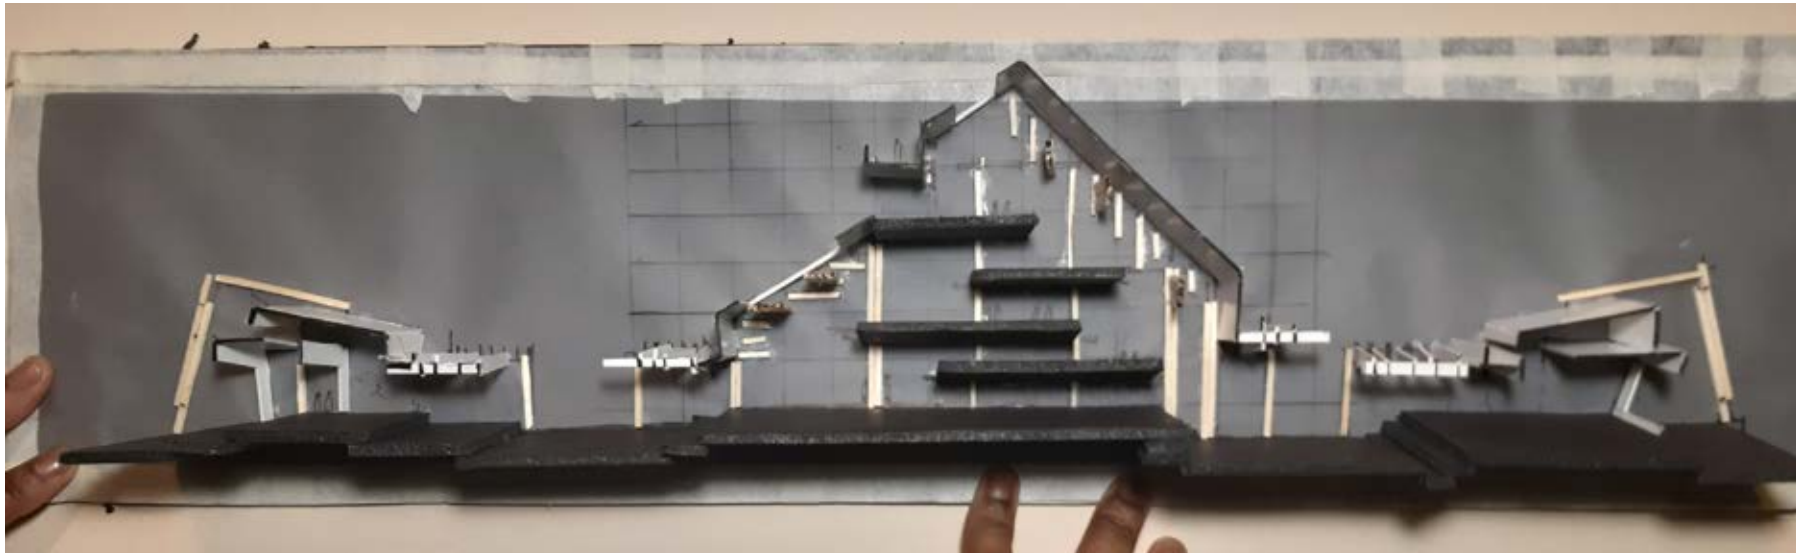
Sectional Model of the Longitudinal strip section, Section A-A
